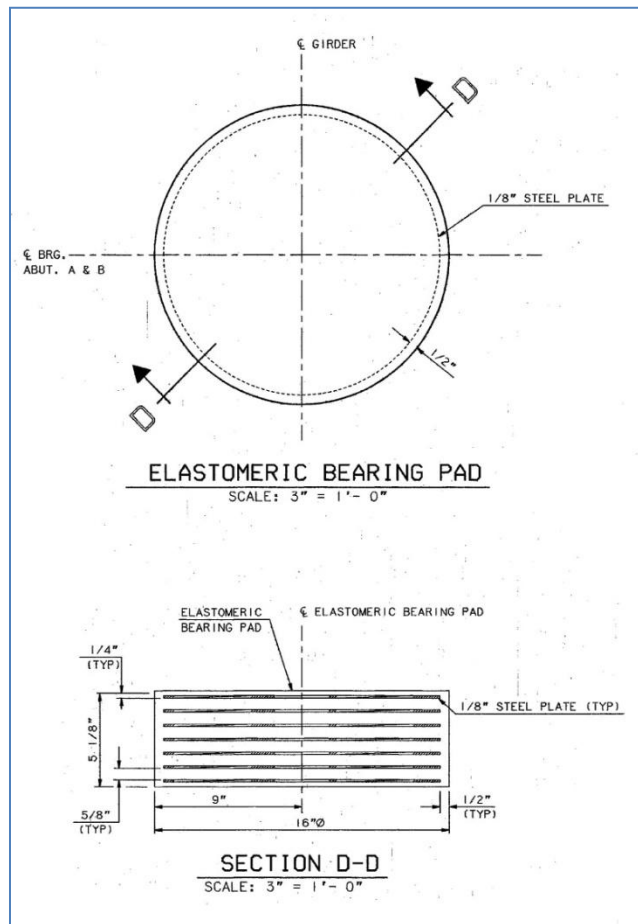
Elastomeric bearing pad details from Rollins Road Bridge Plans (NH DOT Bureau of Bridge Design, 1999)
